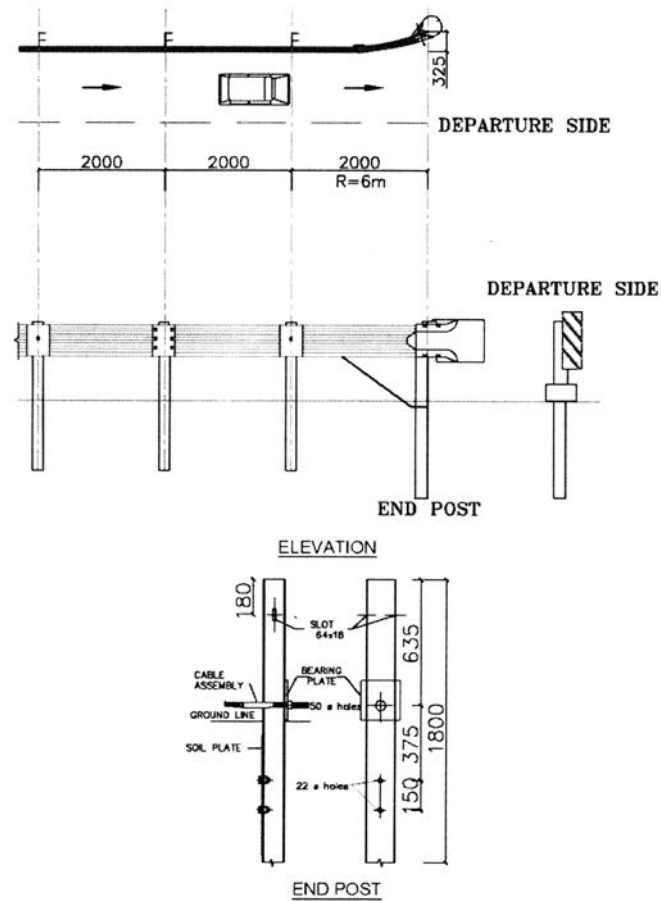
Trailing Terminal (TT) Arrangement - W Beam Treatment on Departure Side
